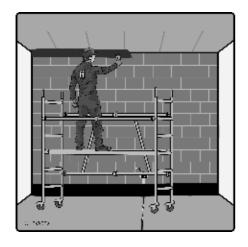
Application of BLOWERPROOF® At wall to ceiling connection.
